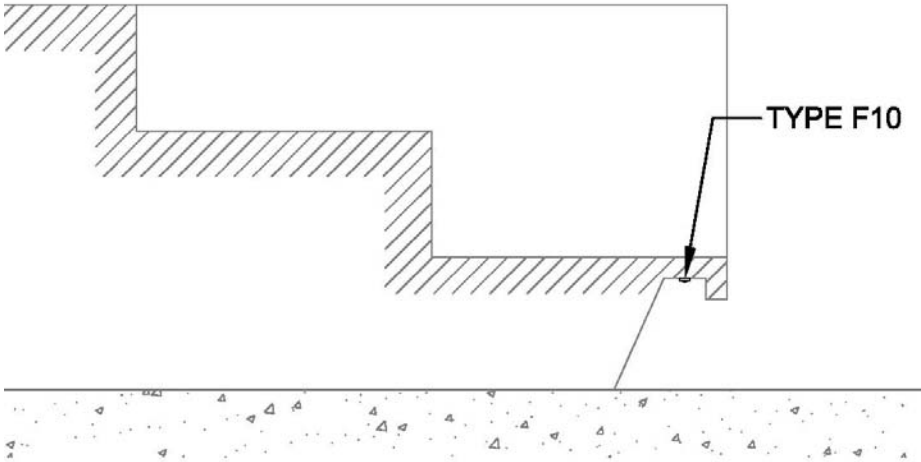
DETAIL #2: FIXTURE TYPE F10
